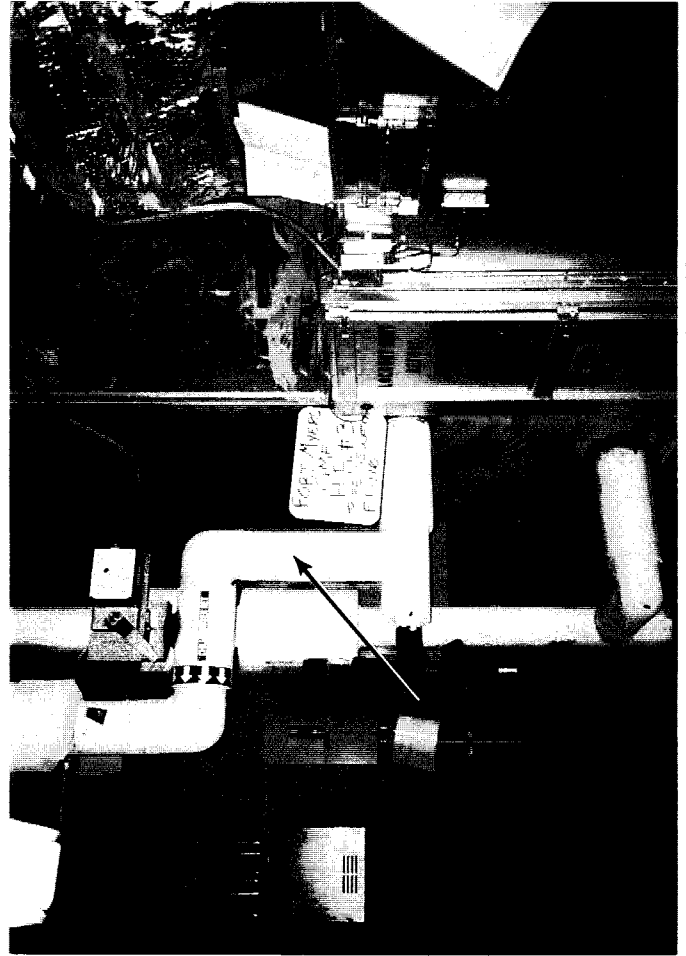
Homogeneous Area 3: Pipe insulation, as found in room F1-116 (non-ACBM)
